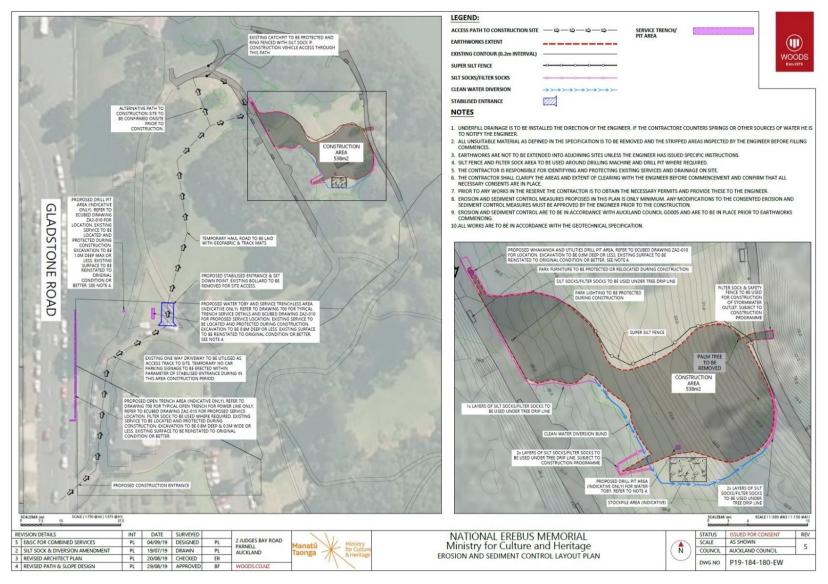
Proposed Erebus Memorial – Erosion and Sediment Control Plan, showing the proposed construction area and haul road alignment (Woods, Sept 2019)
